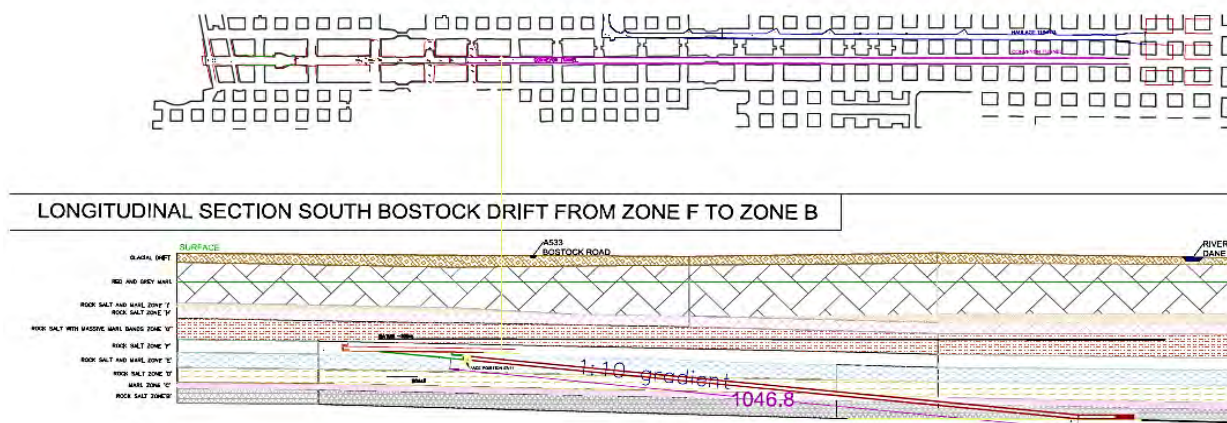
Plan and Section Detailing LSB Drifts at Winsford Rock Salt Mine
